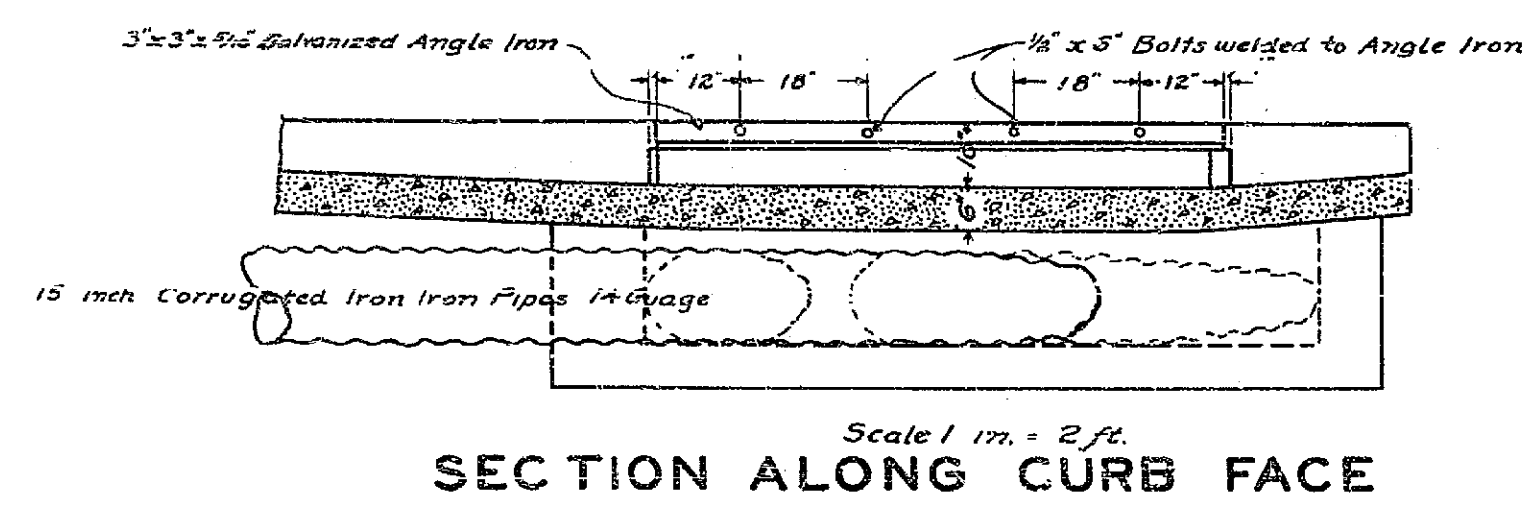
DETAIL OF CATCH BASIN STA 2+24.73 AND CURB STA 2+19.18
